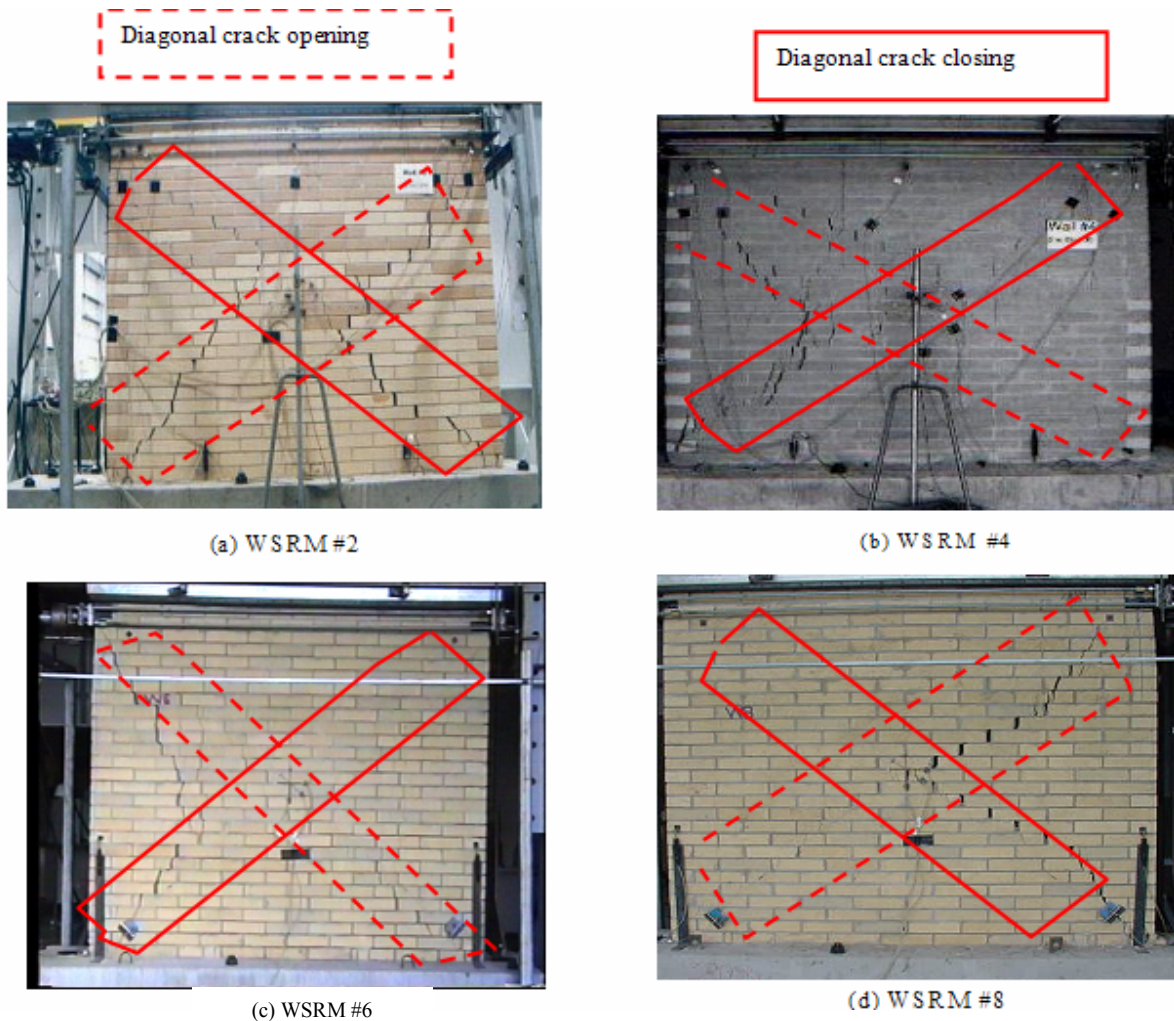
Crack patterns of WSRM walls tested under cyclic loading
